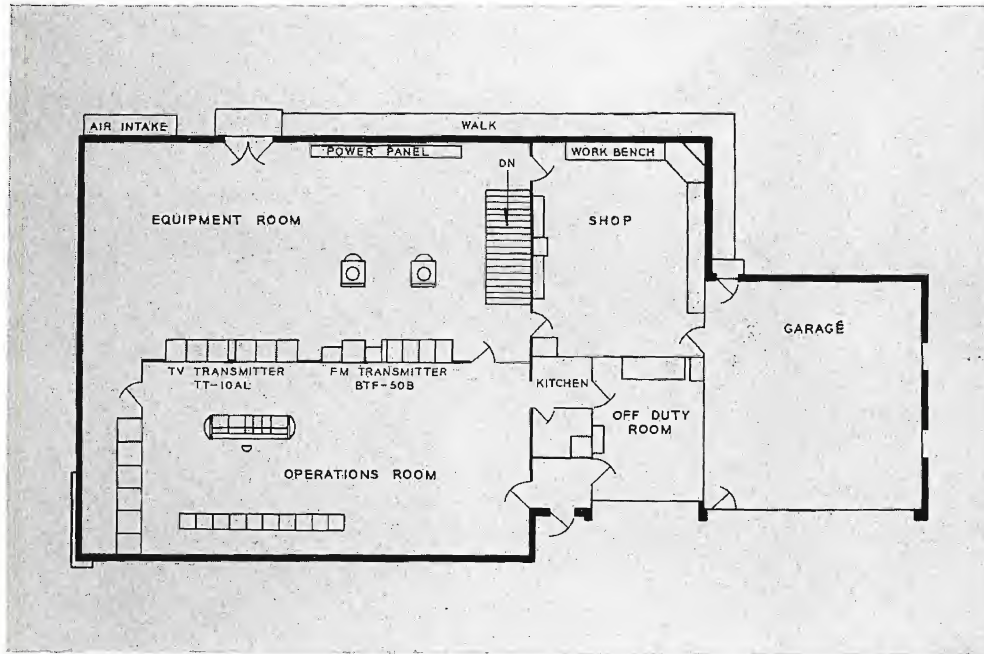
Floor plan of transmitter building, first floor. These spacious quarters house the TT-10AL television transmitter and BTF-50B FM transmitter. Ample shop space, an off-duty area and garage are included.
